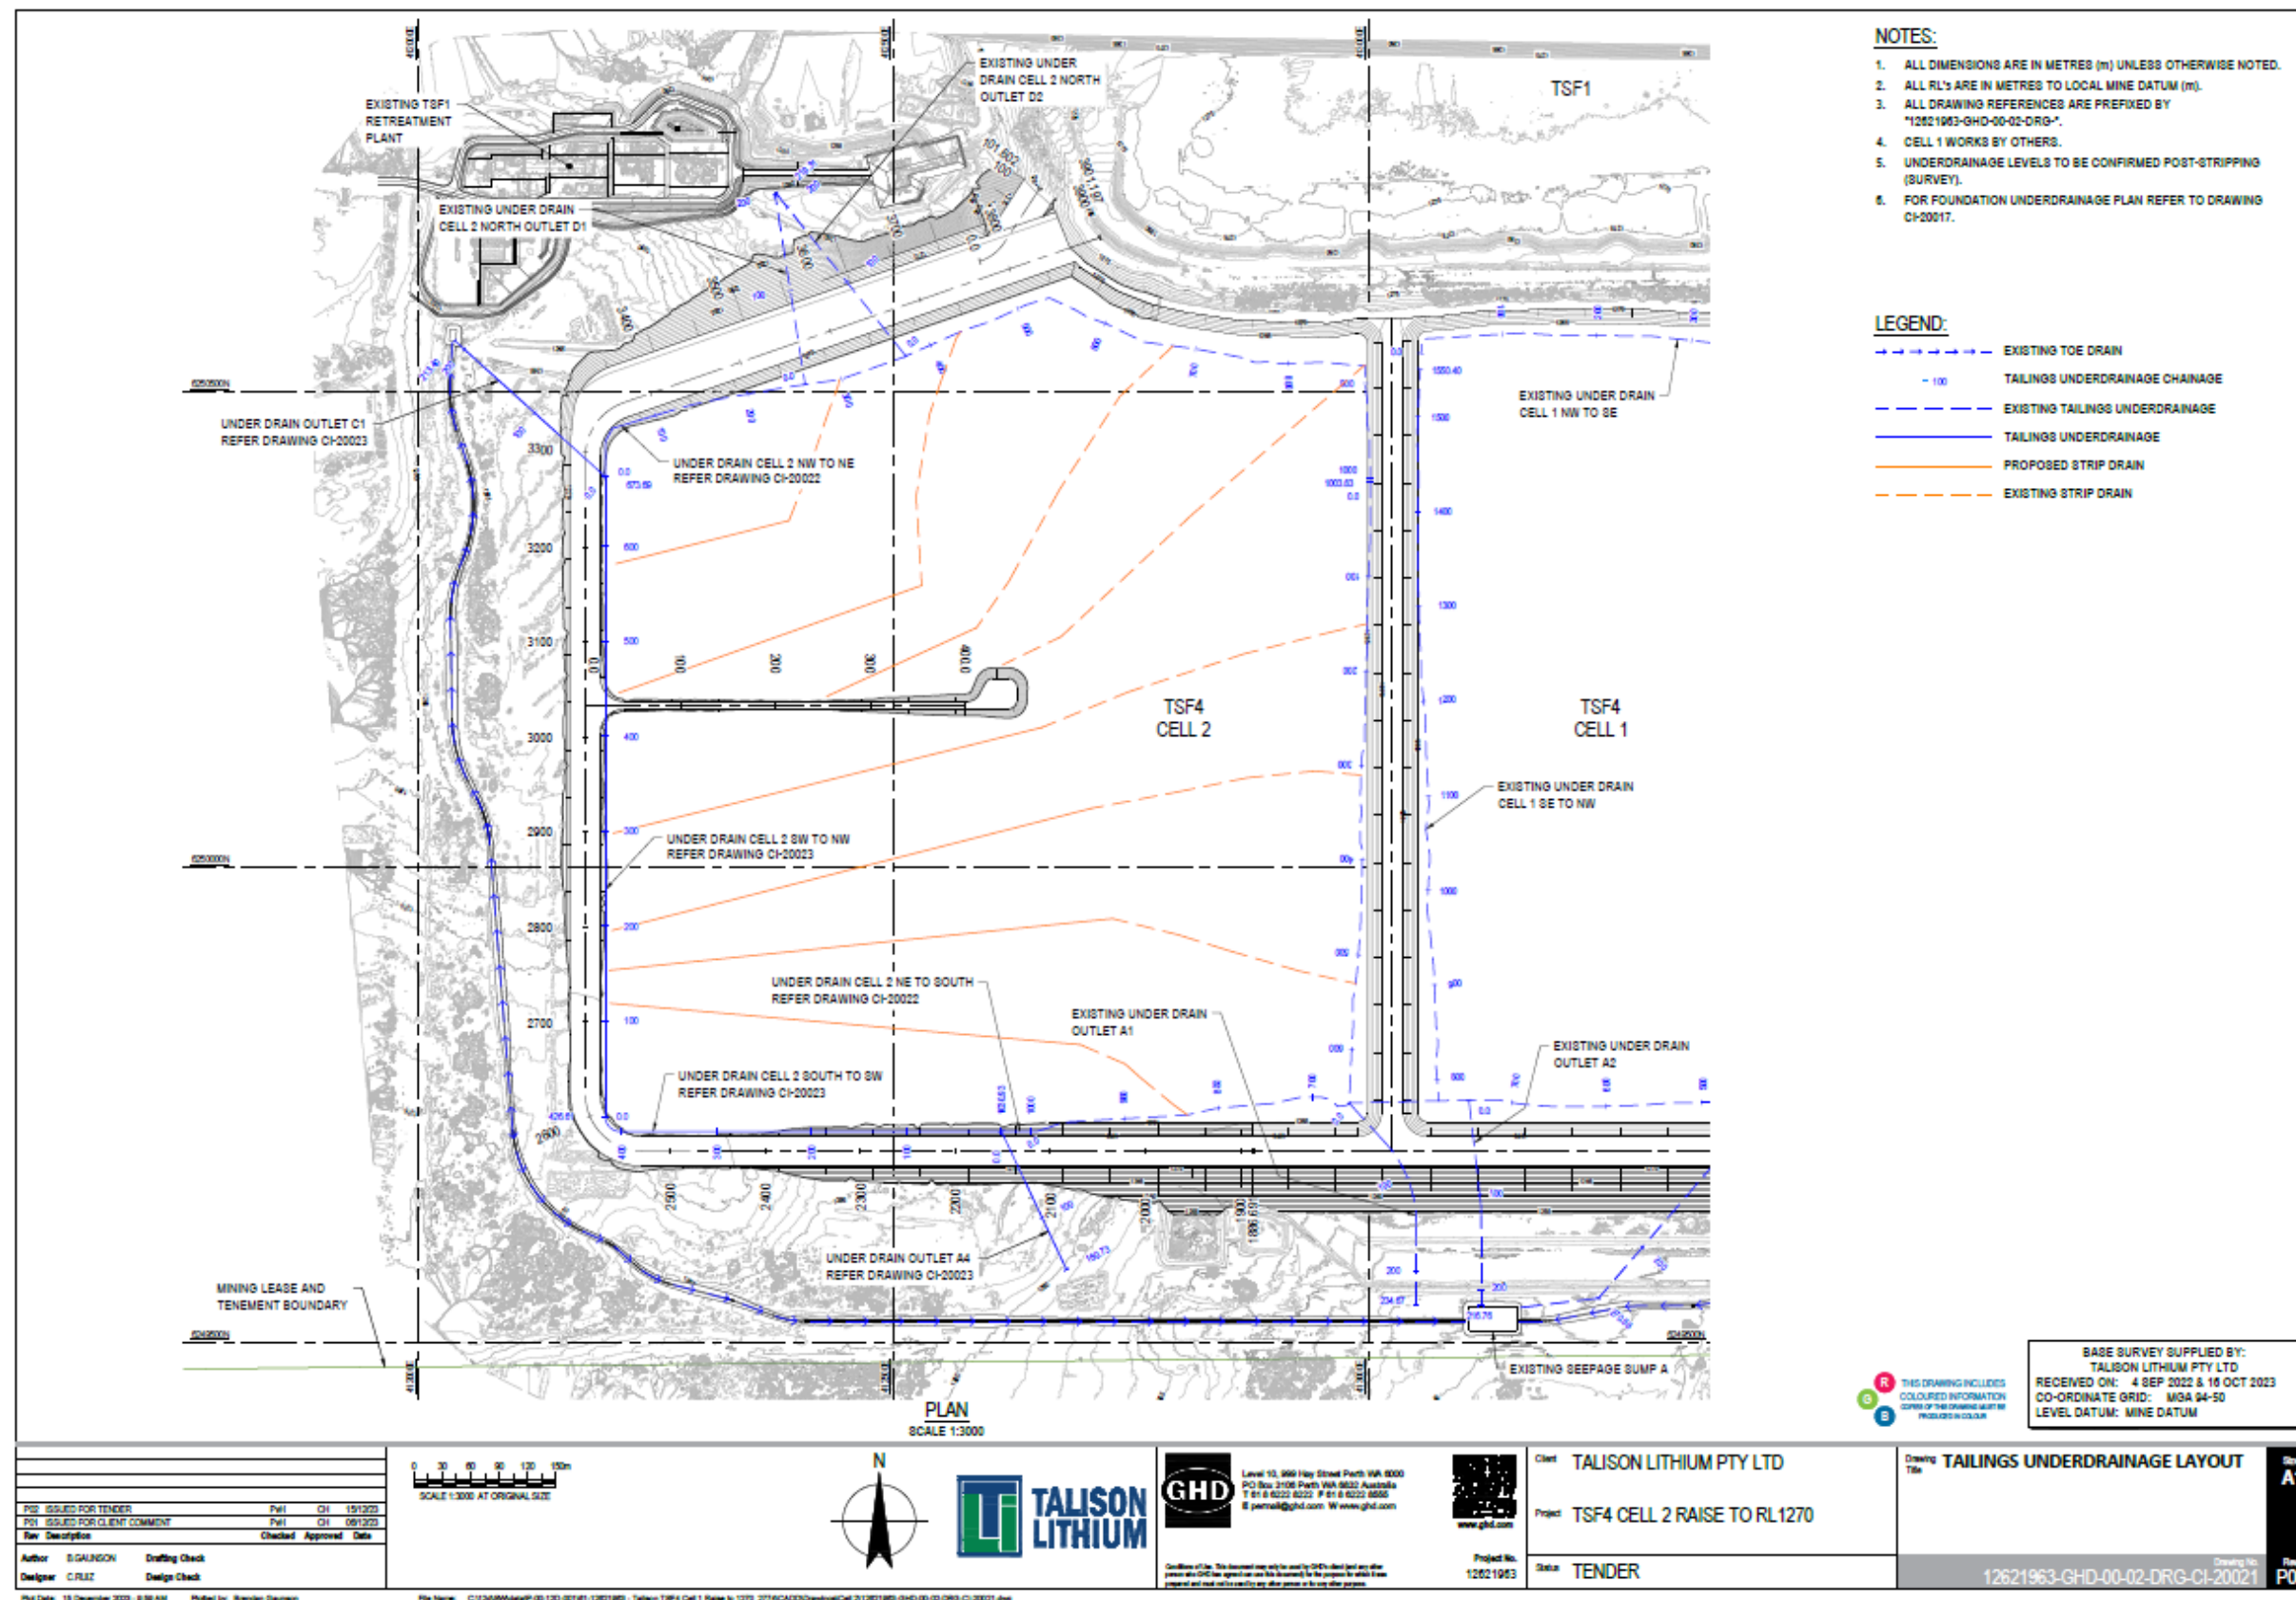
TSF4 cell 2 - tailings underdrainage plan
